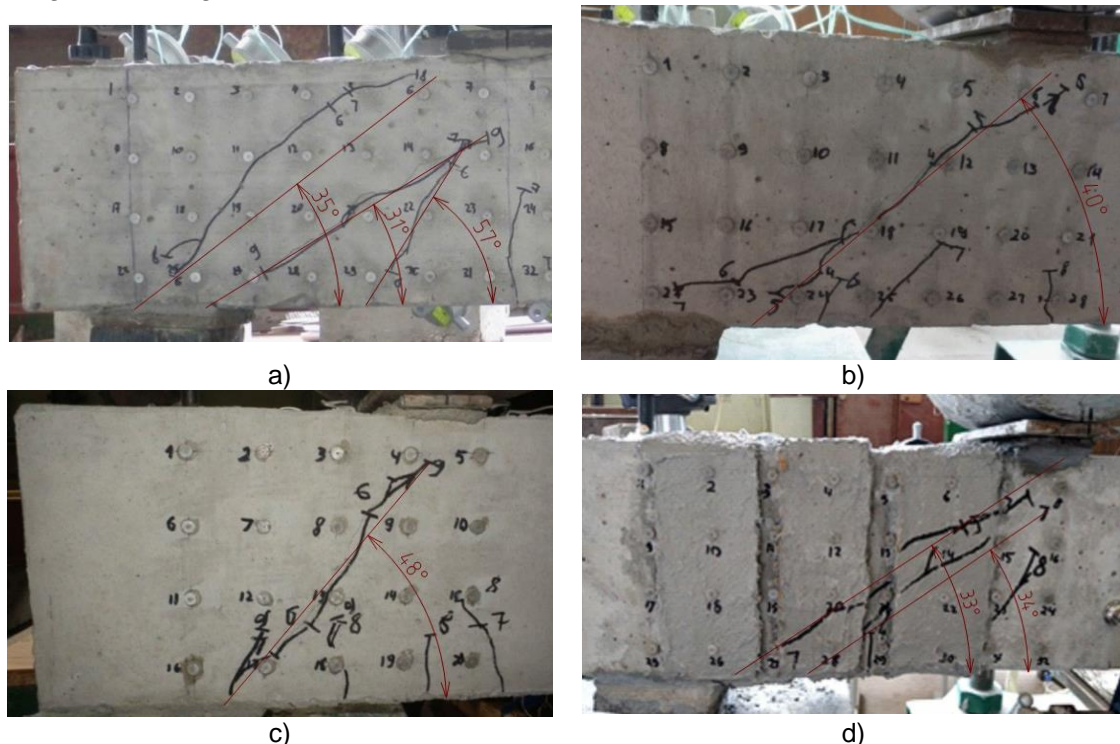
Scheme of opening and distribution shear crack in the beam: a) BO 1.1; b) BO 1.2; c) BO 1.3; d) BSC 1.4
